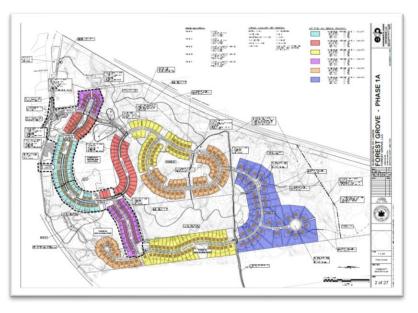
Subdivision plan for Forest Grove 321-Lot Conservation Subdivision
